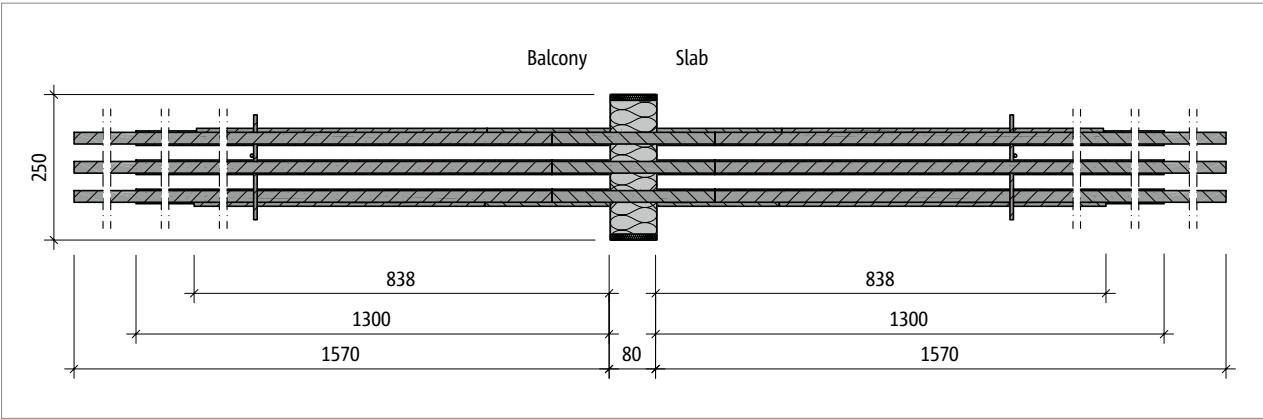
Schöck Isokorb® T type B-M5-V2: Product layout
